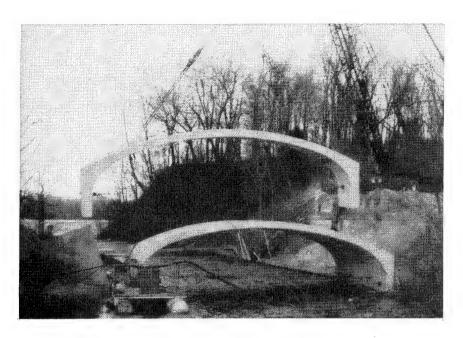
Precast arch-box units being placed at Kent County bridge (from Hurd 1990)
